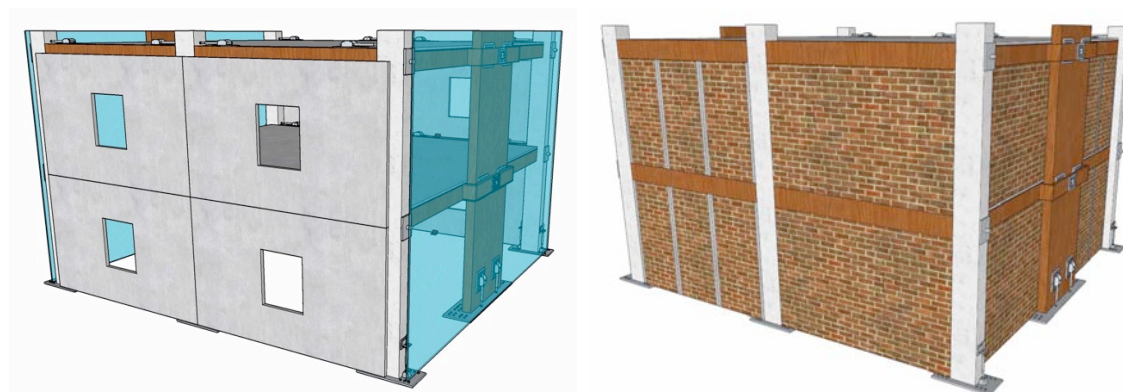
Proposed facades for test specimen: precast cladding panels and spider glazing system (left) and unreinforced clay brick infill walls (right).
